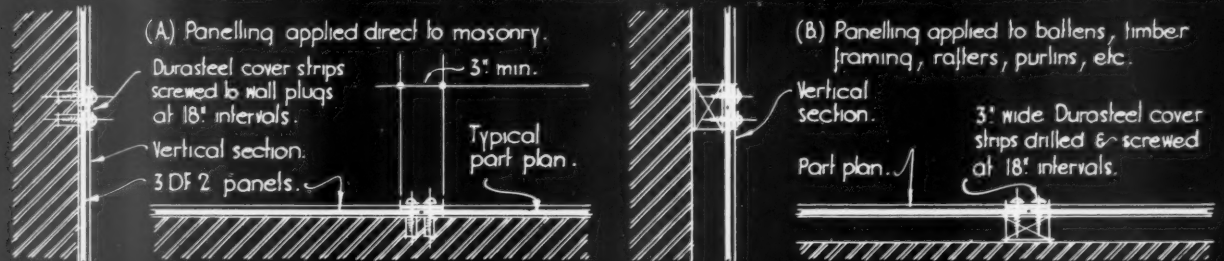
DETAILS SHOWING TYPICAL METHODS OF ERECTING THE SHEETS IN TIMBER & STEEL STRUCTURES.
